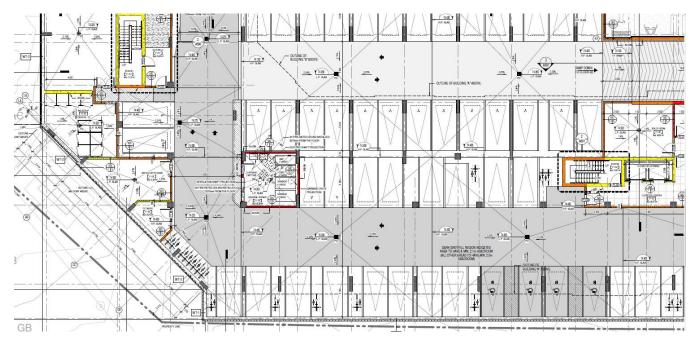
Extract of the Floor Plan of Basement Level 1, under Building A
